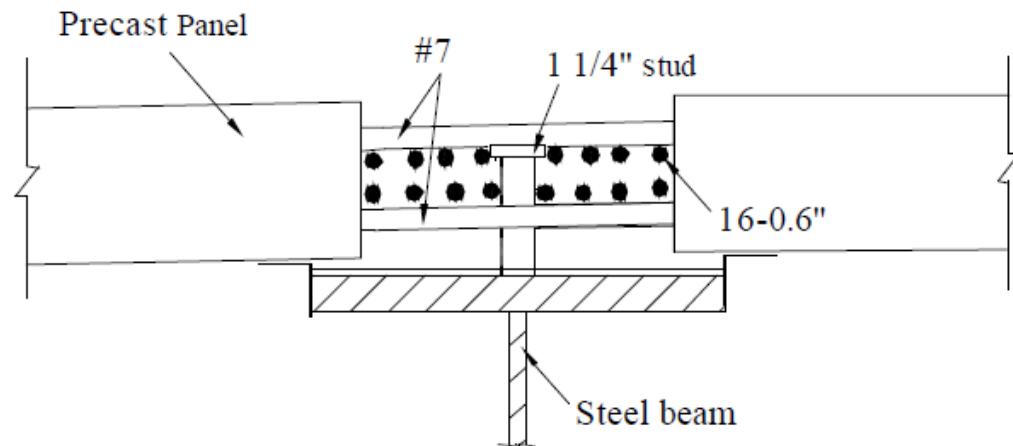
Skyline Bridge Cross Section (Sun, 2004)
